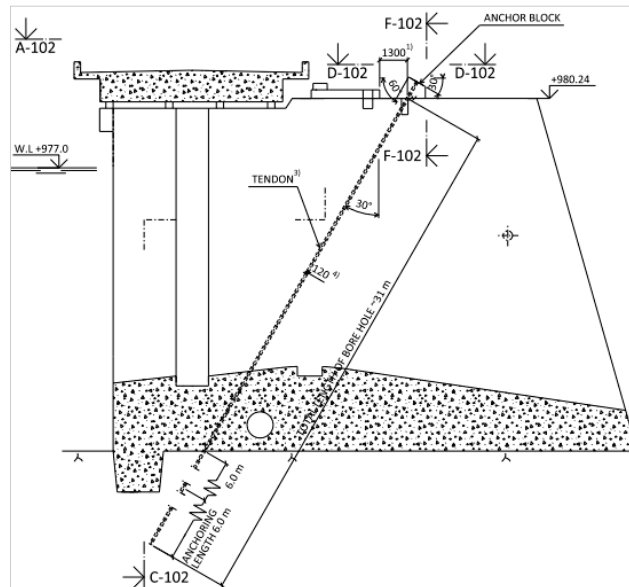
Pre-stressed cable anchoring in dam pier, conceptual sketch
